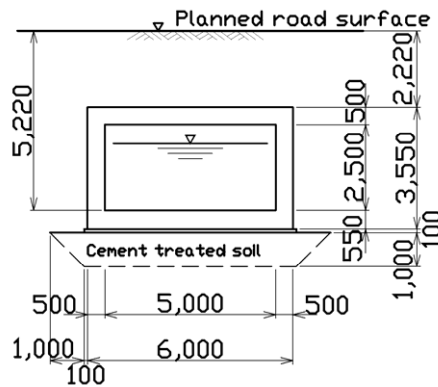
Box culvert cross section (Bridge No.2)
